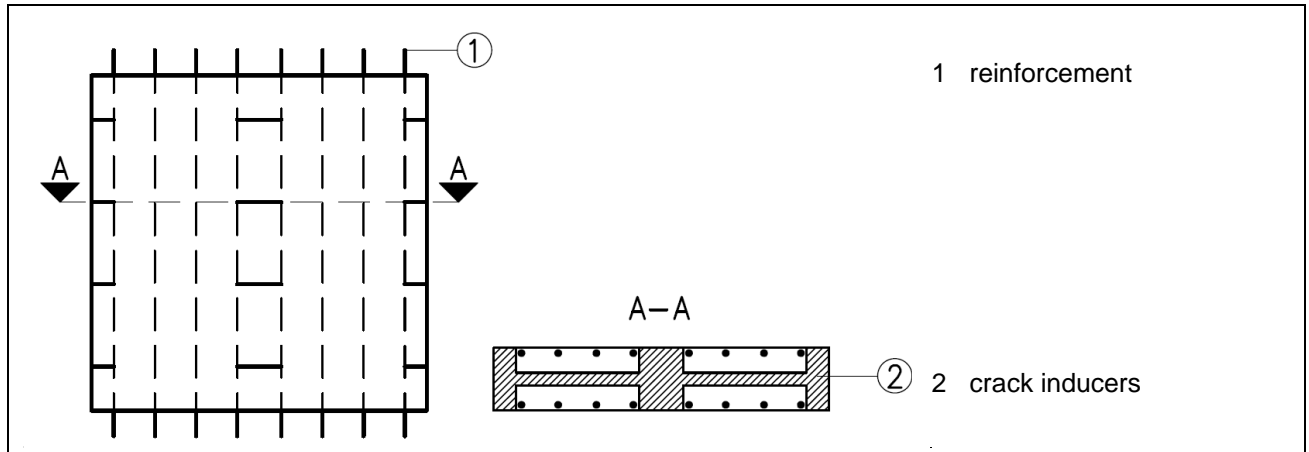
Example of a test member for fasteners tested in cracked concrete
